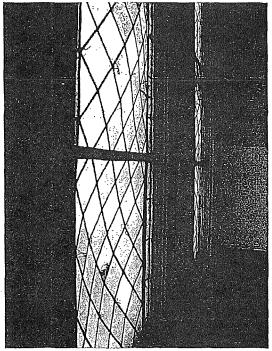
b. East tower, east windows, showing bowing of windows due to sagging lead cames or detachment from saddle bars.
